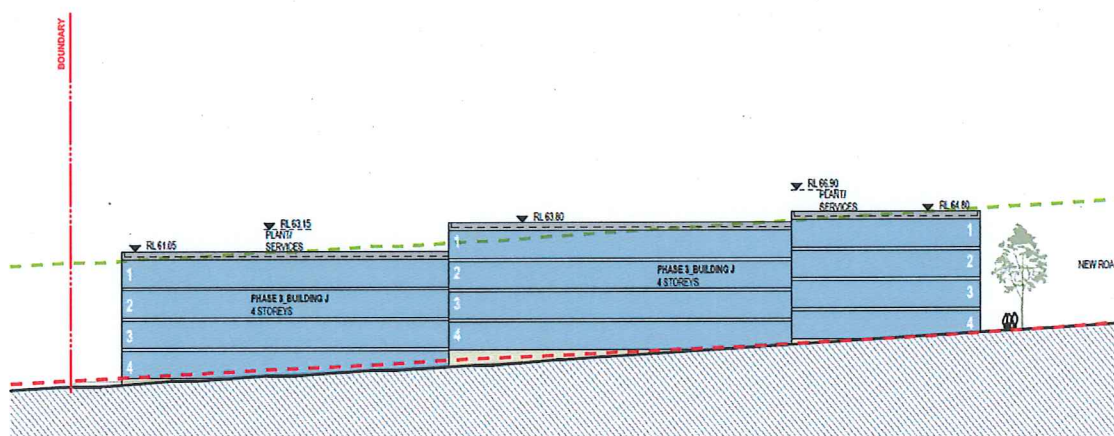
Extract of an isometric site plan showing the building envelopes approved in the Concept Plan (JRPP-15-02701).
